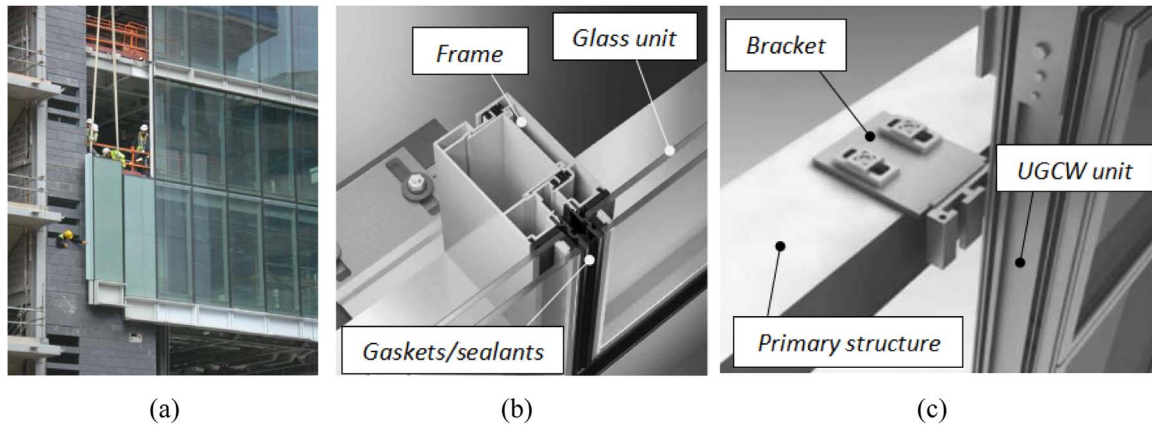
Examples of UGCWs: (a) installation process, with typical detail of (b) glass-to-frame connection and (c) supporting rigid bracket.
